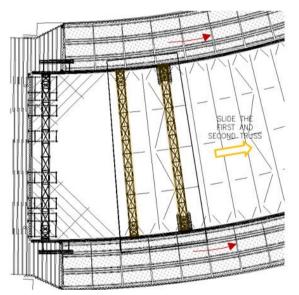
Skidding mega truss from UWT Stage 1 bulkhead towards the Kai Tak seawall
